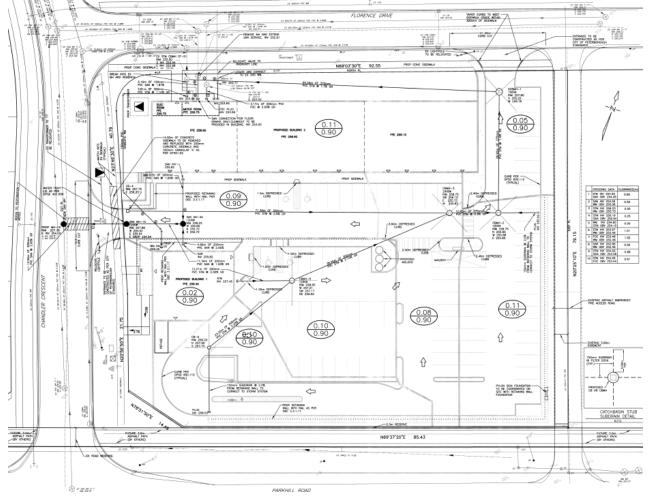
Exhibit B – Site Plan Set of Drawings, Site Servicing Plan, Page 4 of 6
